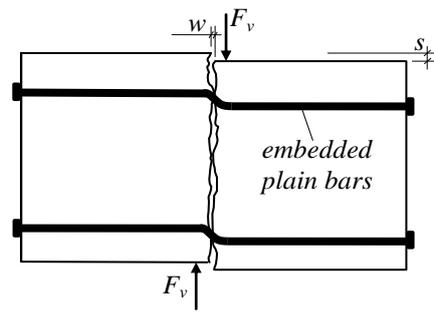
The connection is tied together by embedded transversal bars, anchored by end-anchorage. The figure is based on fib (2008).
